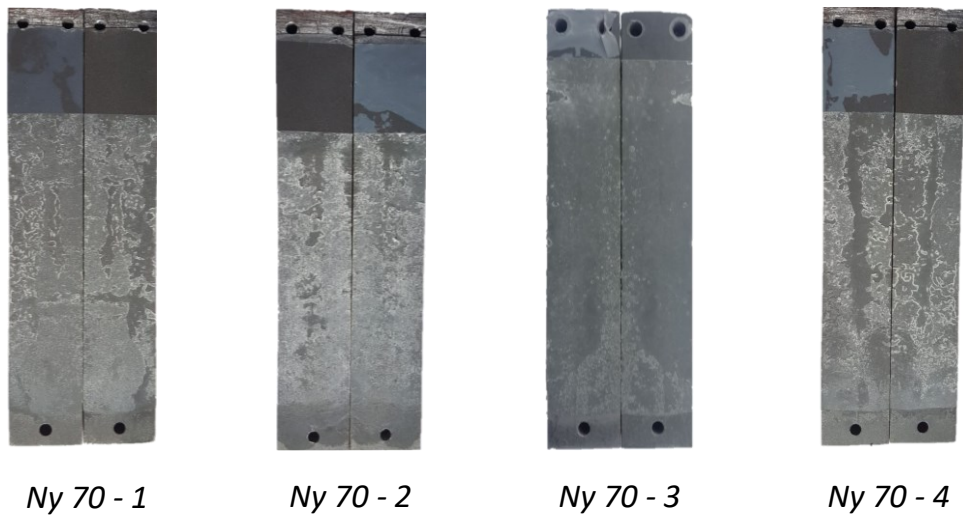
Fracture surface of Ny 70 samples
